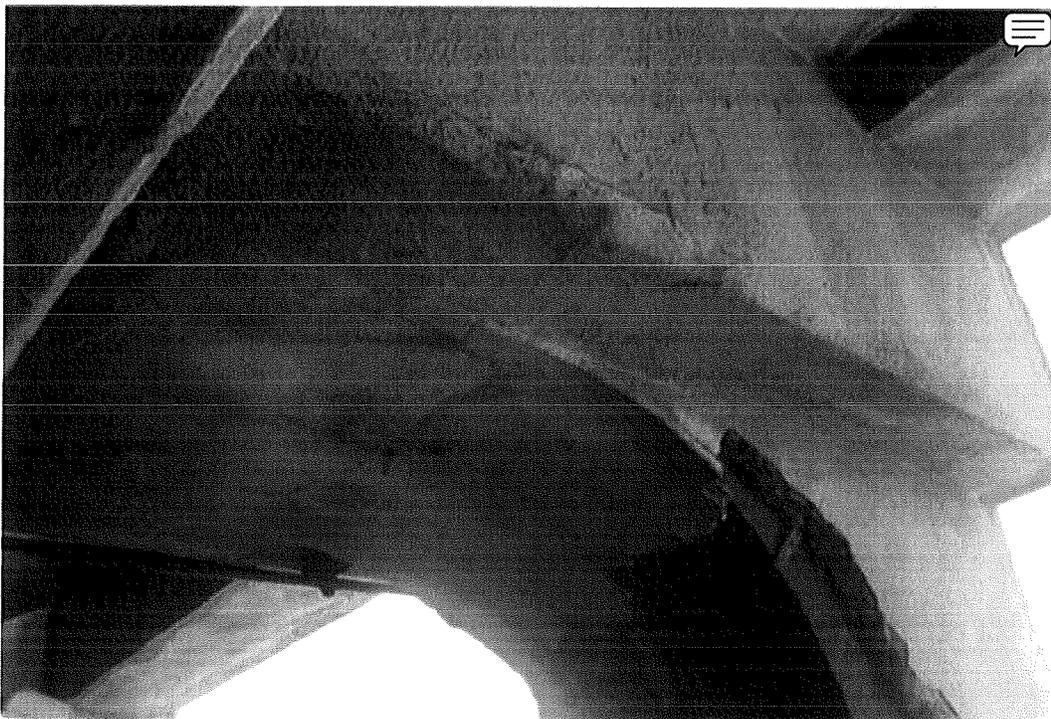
Cracked and hollow sounding concrete encasement. Underside of Parking Level 6 ramp, Above car ramp, at Column Line 1/L3. (Approx. 20 SF)
